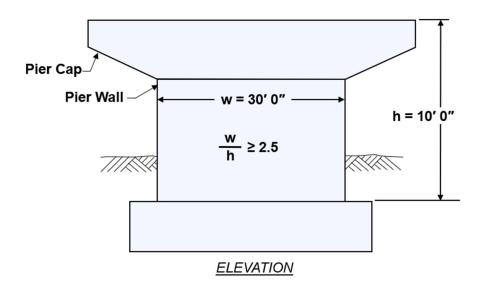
A—Elevation View for Hammerhead Pier with Pier Wall Example
